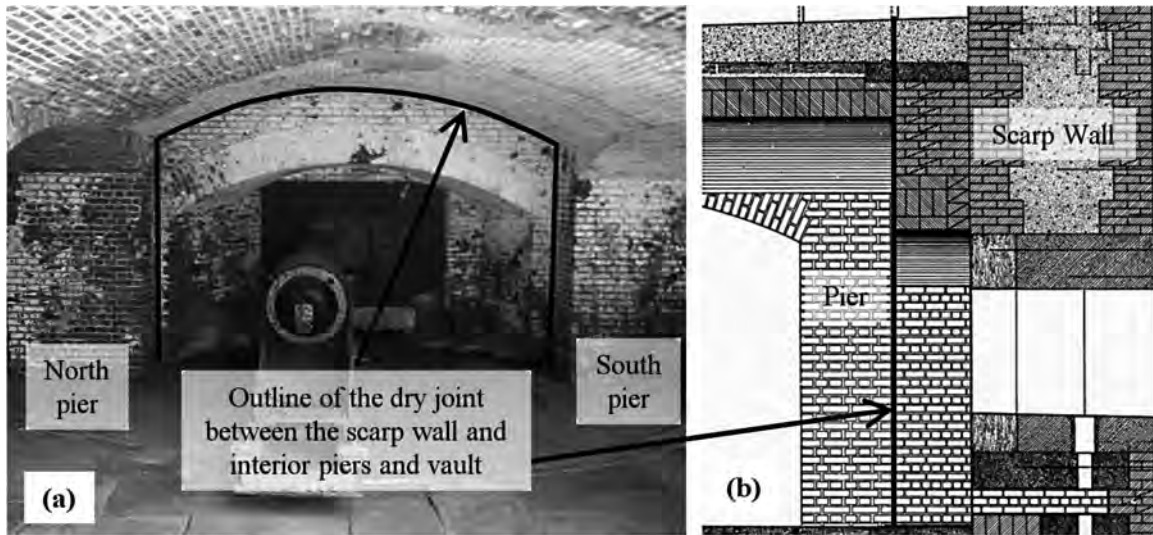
Casemate used for connectivity tests showing the outline of the scarp wall interface (a) in elevation and (b) in section.
